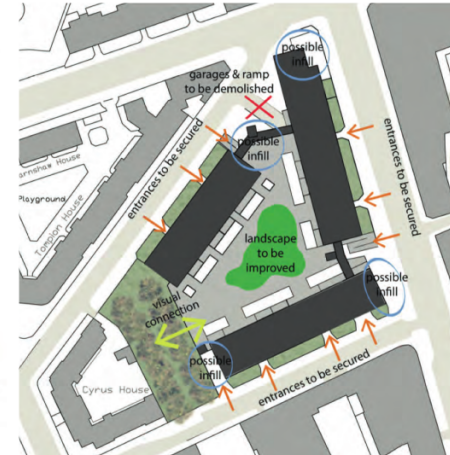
Concept plan for redevelopment, showing infill, landscaping and security improvements.
